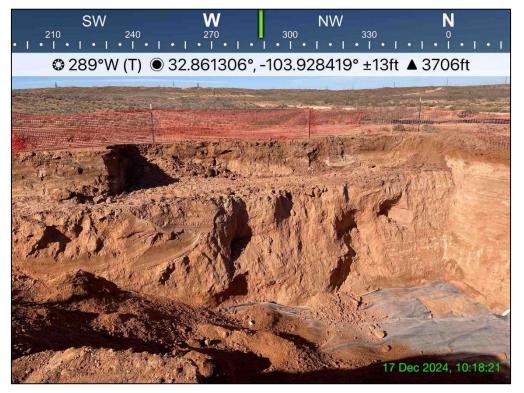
Excavation overview, facing west-northwest of FL06@20, SW06, SW11, and SW13
